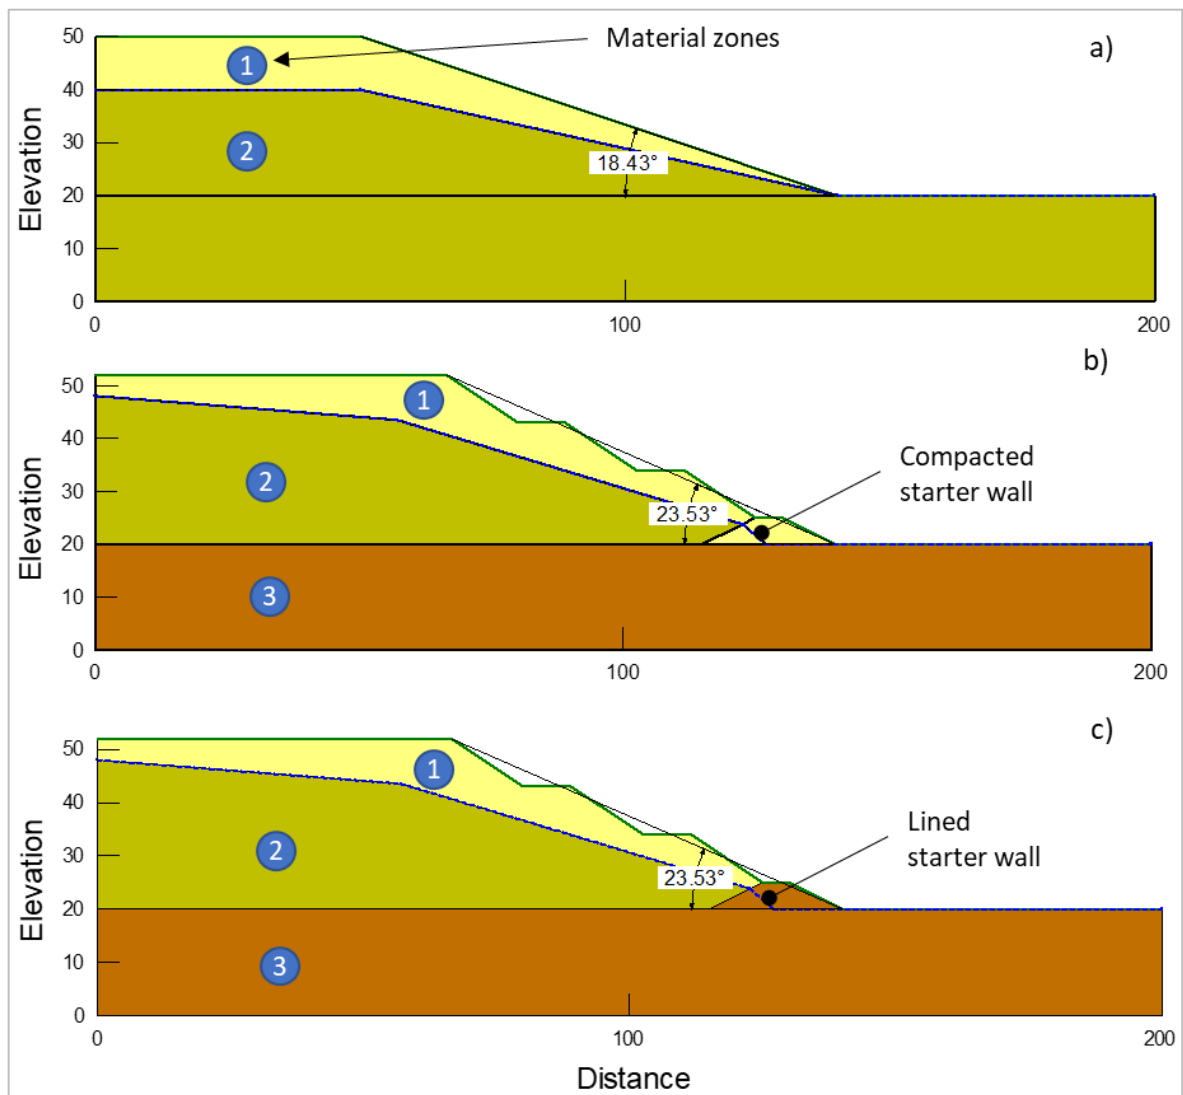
Cross sections assessed: a) uniform slope, b) typical tailings dam with a compacted starter wall, c) typical tailings dam with a lined starter wall
